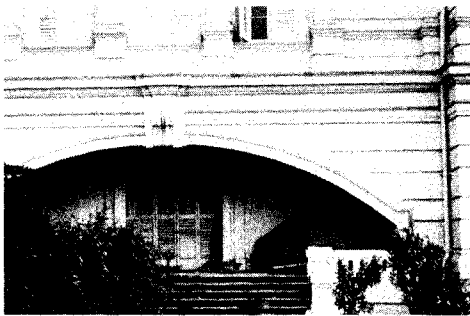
Raj Bhawan, Patna (Horizontal Crack over the arch in right half)
